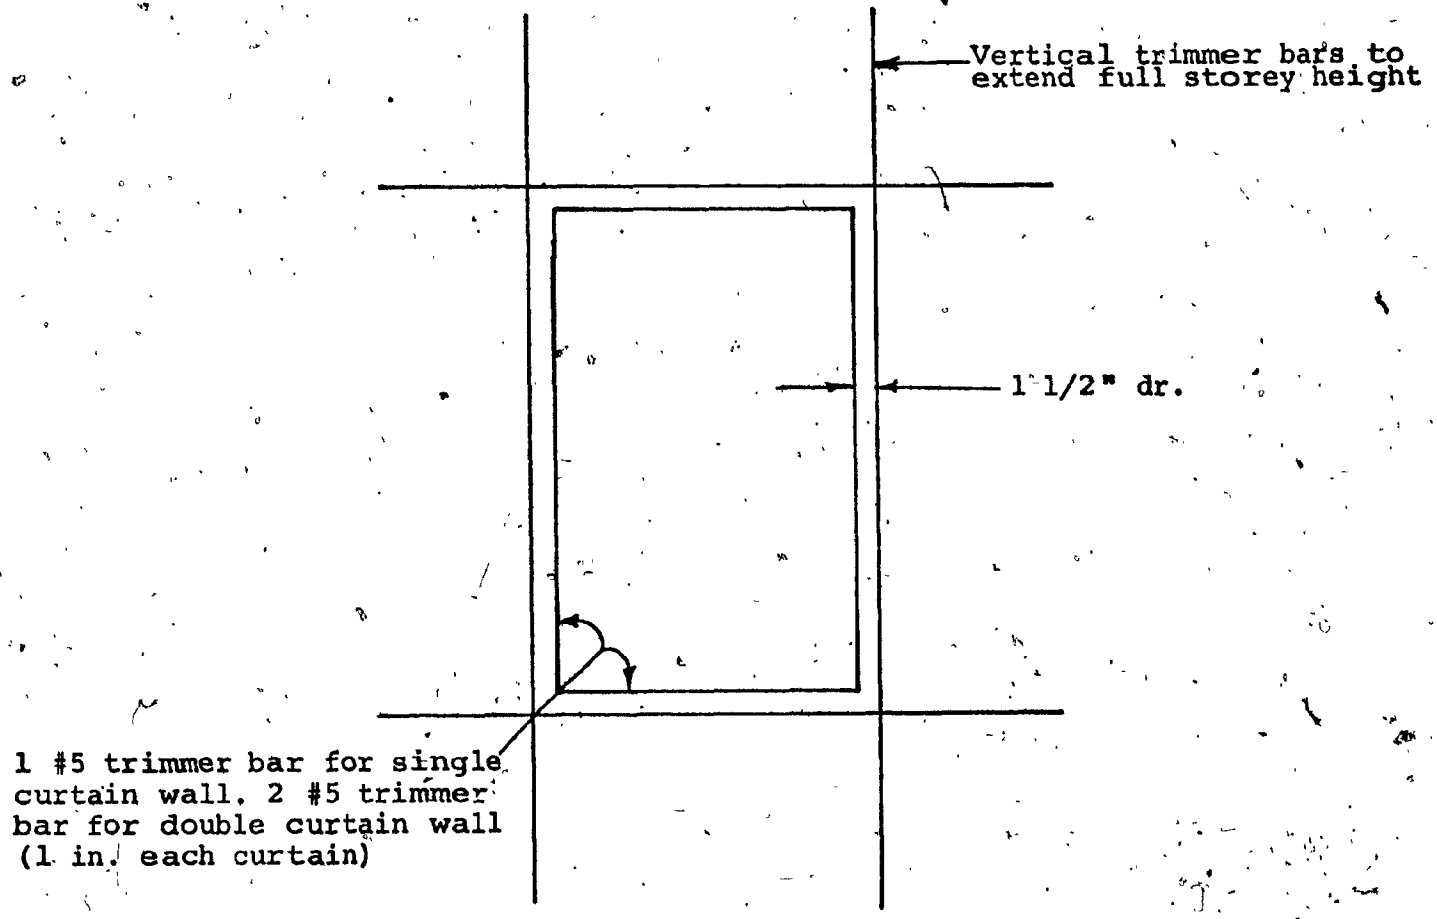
Supplementary Reinforcement to be Provided at Wall Openings
